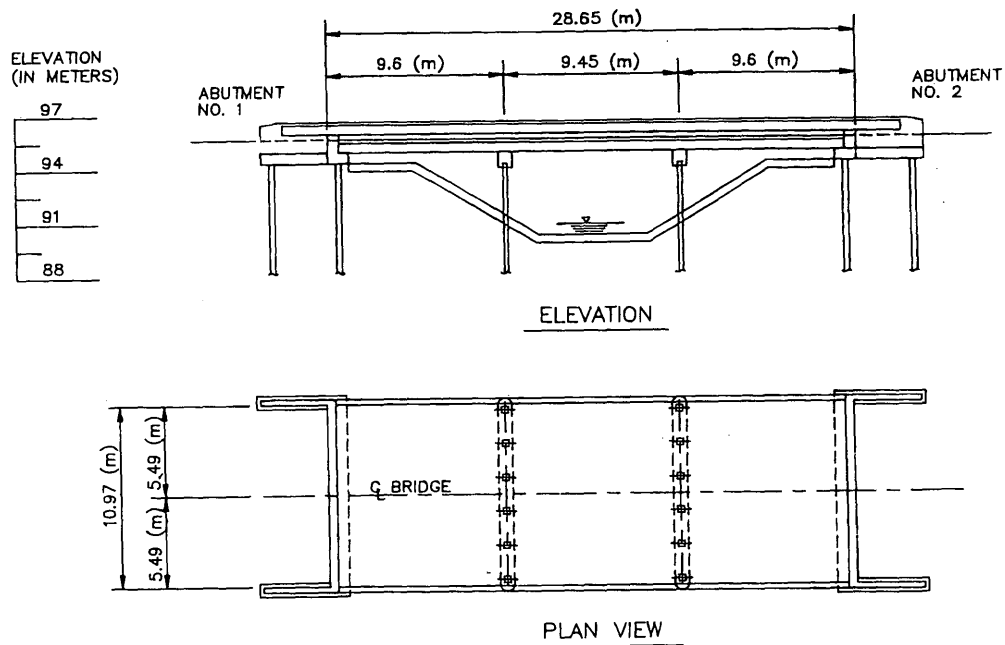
Plan and elevation of Haywood County bridge (SR-54 over Nixion Creek) constructed by TnDOT in 1992 (1 m = 3.281 ft).
